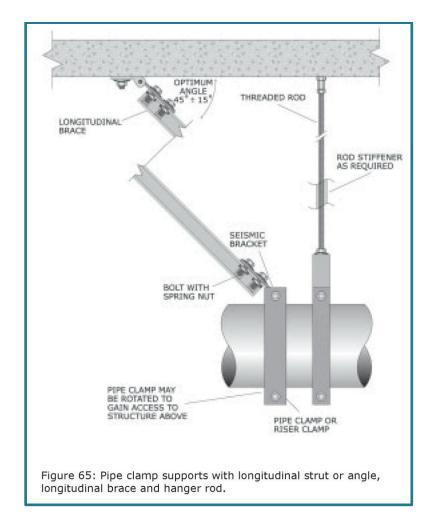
Pipe clamp supports with longitudinal strut or angle, longitudinal brace and hanger rod.
